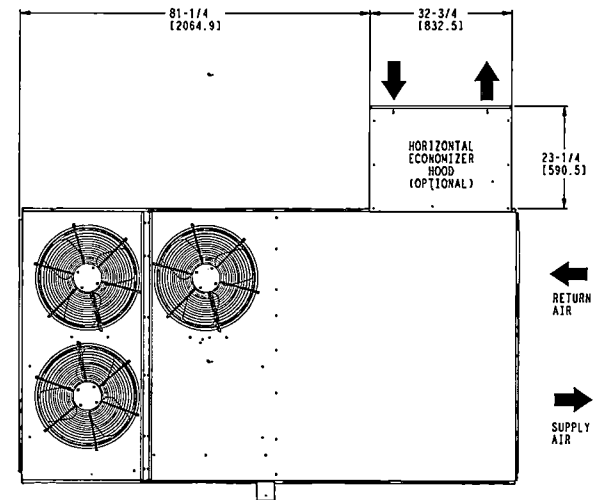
Dimensions 48TC 16 (Sheet 1 of 2)
